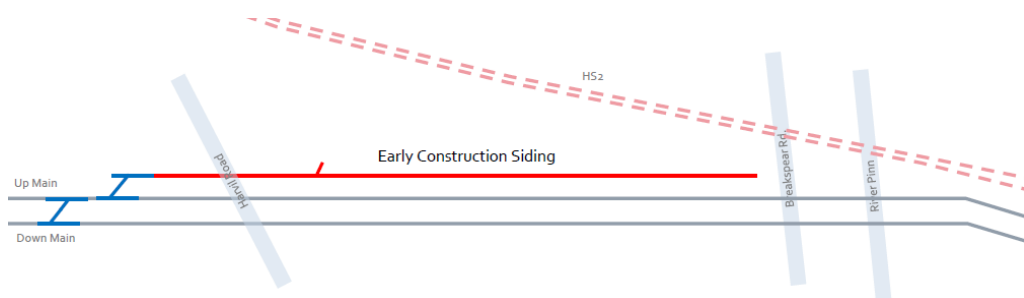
Early Construction of Rail Siding at West Ruislip Railhead
